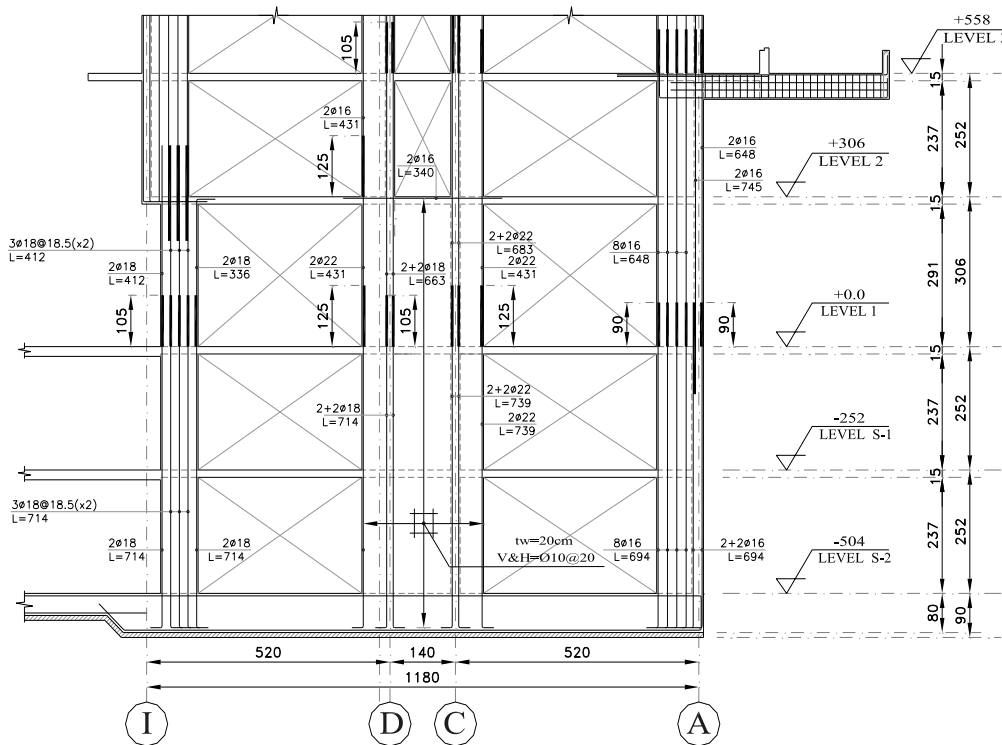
Alto Rio building axis 11 elevation view (Unit: cm) (Note: 1 cm = 0.3937 in)
